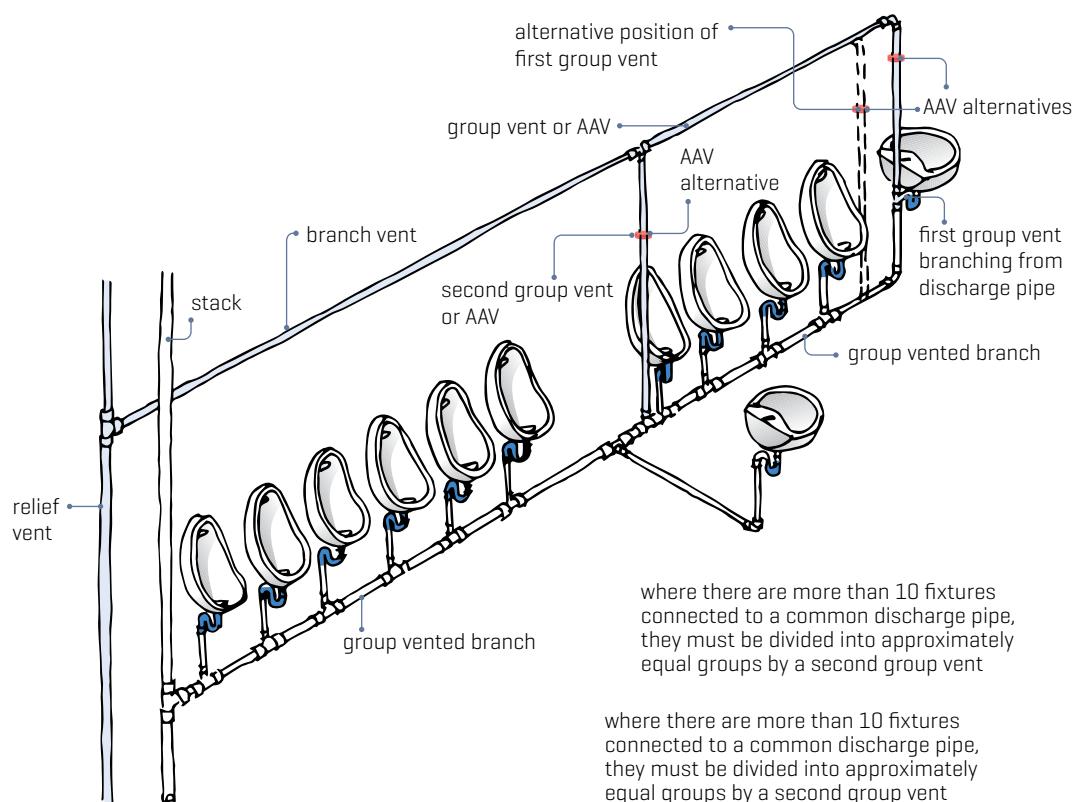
Group venting more than 10 fixtures – the principles apply to all types of fixtures.
